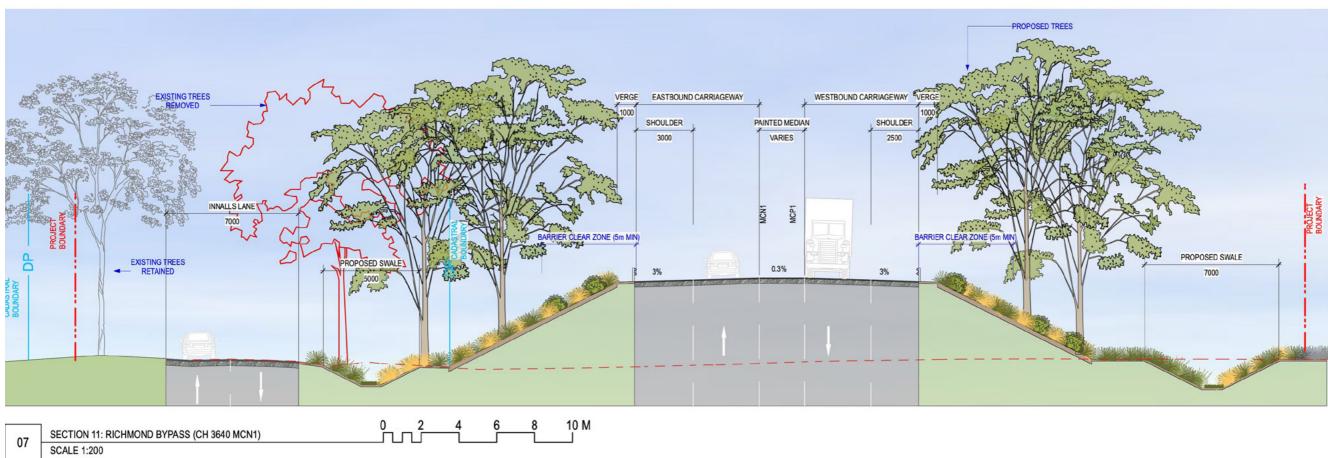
Stage 2A urban design sections - sheet 4 of 4
